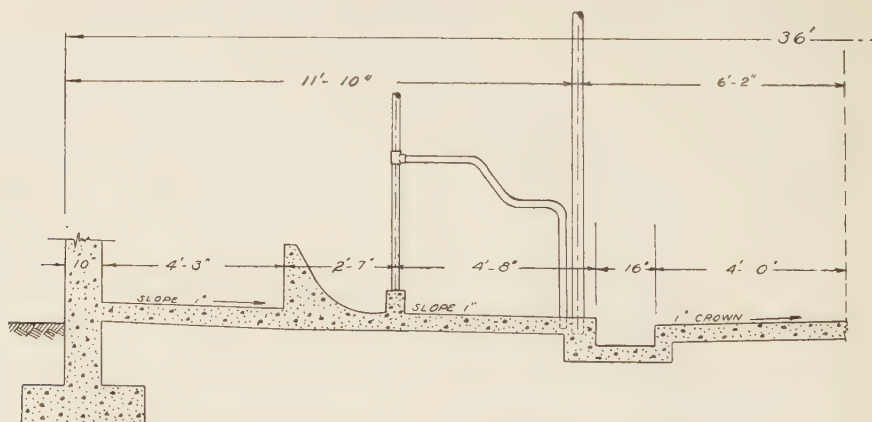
Cross section of a 36-foot barn with "face-out" arrangement.
